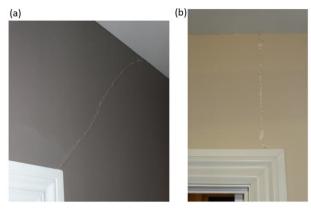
Plasterboard bracing walls damage after the 2010 Darfield earthquake: (a) diagonal cracking of plasterboard; (b) vertical cracking of plasterboard [8].
